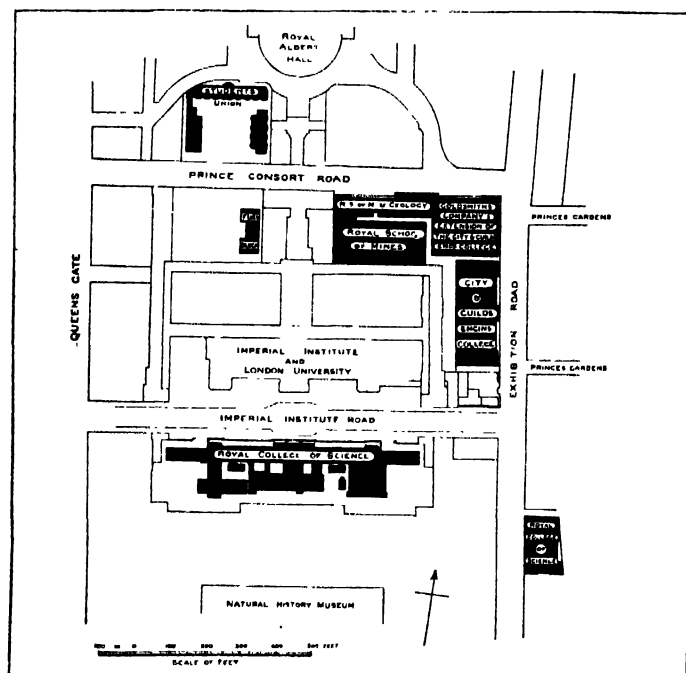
General plan of the associated buildings which have been erected on the site of the 1851 Exhibition. The areas coloured black indicate the buildings of the Imperial College of Science and Technology.
